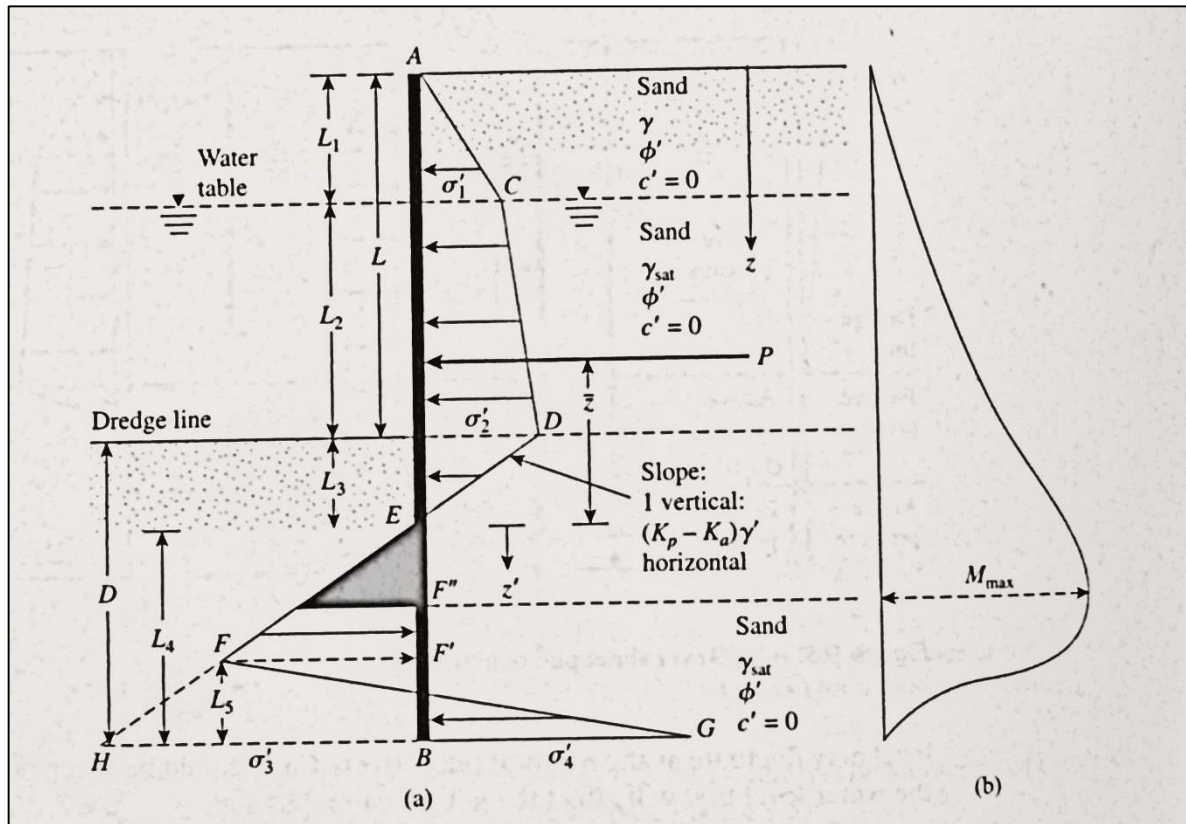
Cantilever sheet pile wall in sand; (a) Net pressure, (b) Moment diagram (Das 1990)
